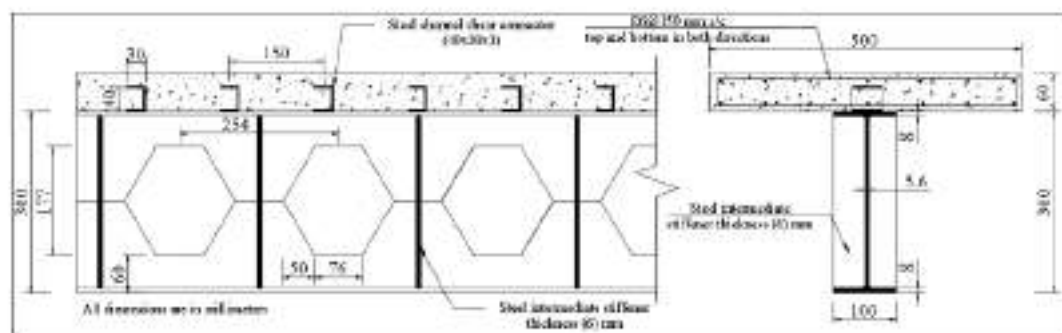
Composite Concrete-Castellated Steel Beam Details[33].
